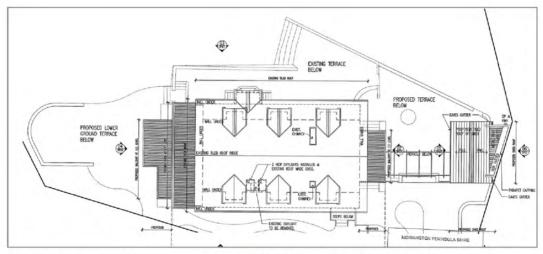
Plan of proposed development at 10-12 View Point Road (source: JDA Architects – Appendix B, Ref 16)
